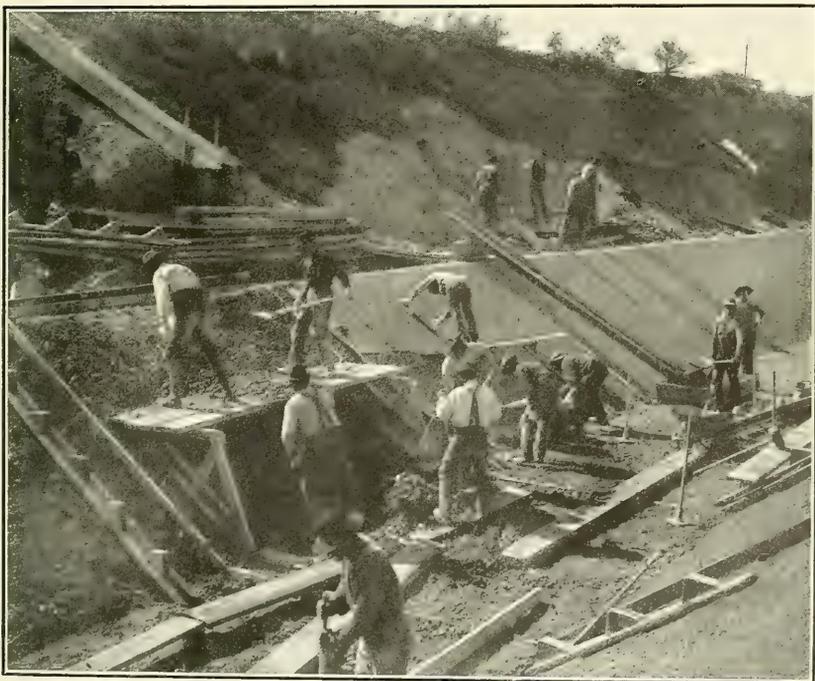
METHOD OF DELIVERING CONCRETE FOR SIDE LINING, RIDENBAUGH CANAL.
